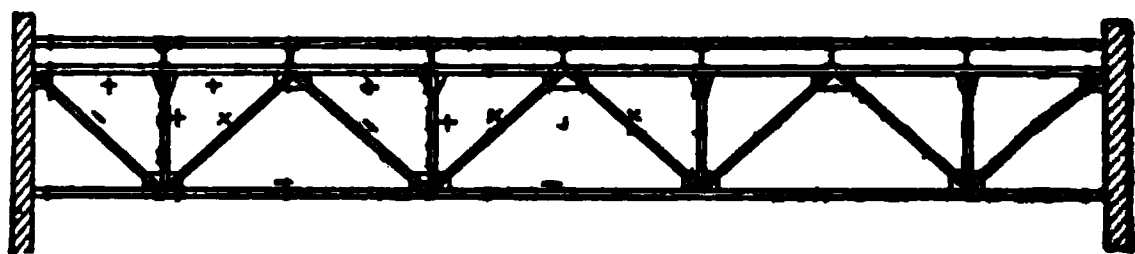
Warren Truss with Verticals. Span Fifty-six Feet
